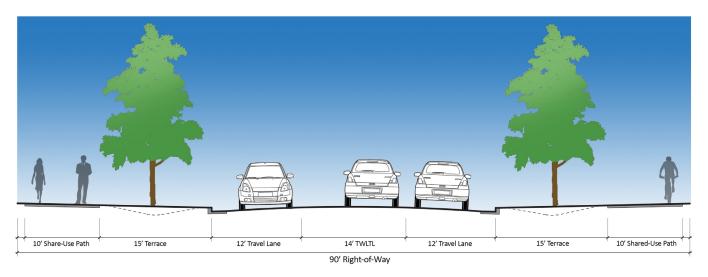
Nelson Road Cross-Section with 90 feet Right-Of-Way, east of Reiner Road
